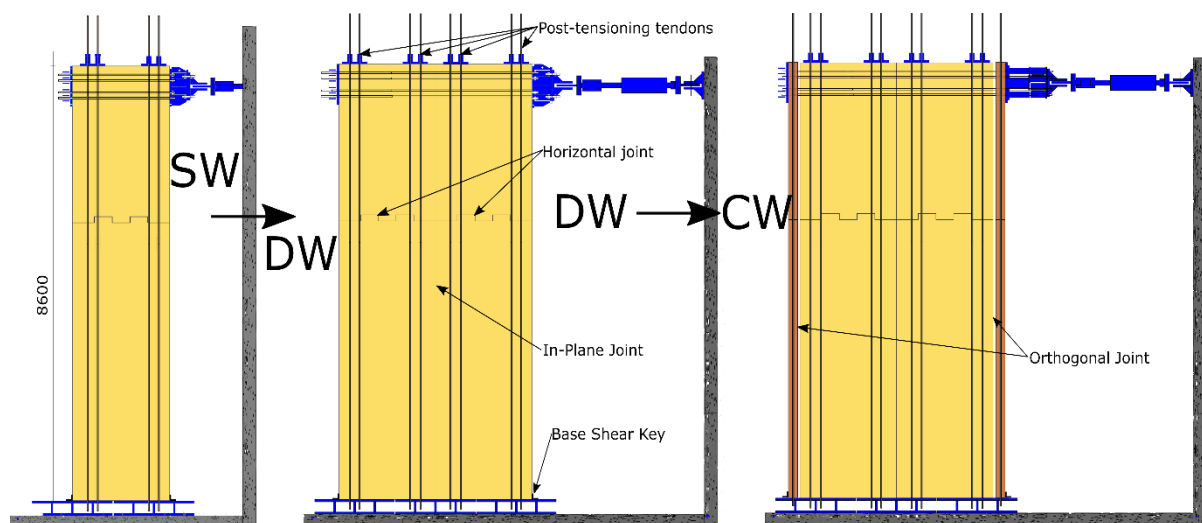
Three phase shear wall testing plan programme: single wall, double wall, and core-wall
